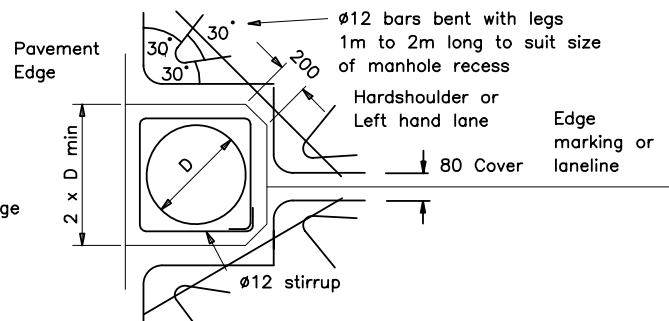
JOINT WITHIN MANHOLE DIMENSION
